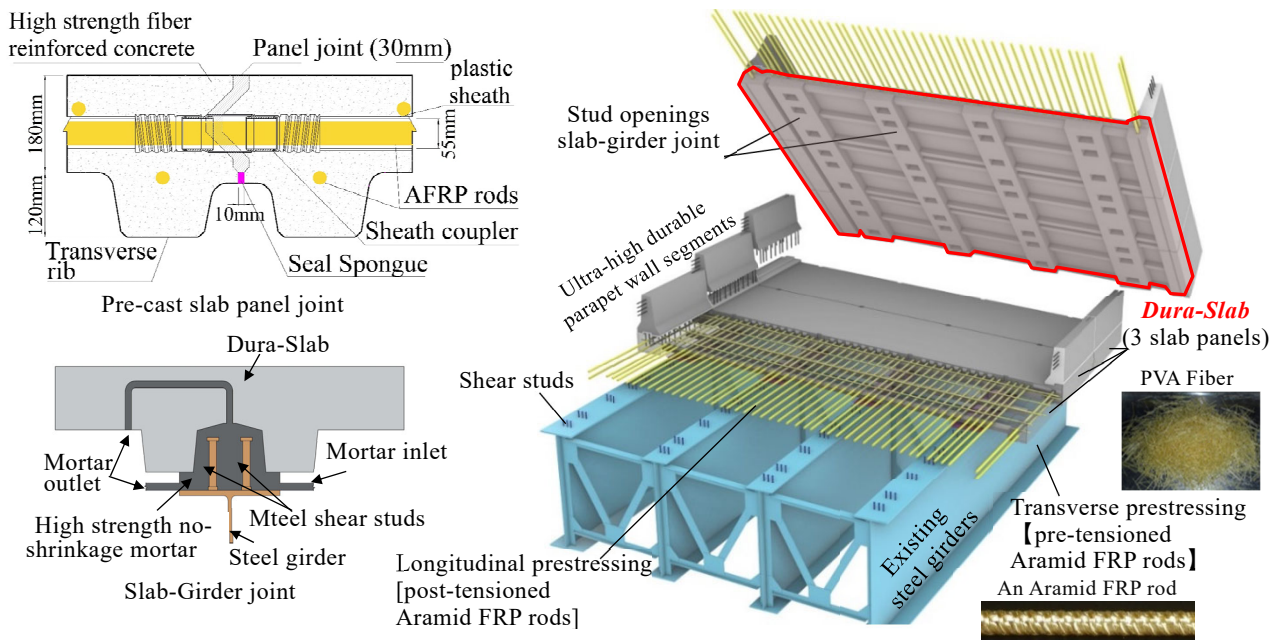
Components of Ultra-high durable slab and structural arrangement in a slab deck renewal project
